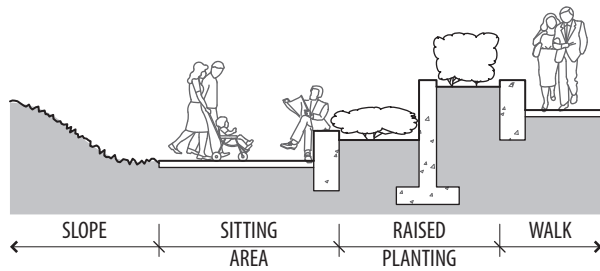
Level changes for privacy. Raised planting separates and visually screens the sunken sitting area from the sidewalk. The slope is used to add to the spatial enclosure of the sitting area.
